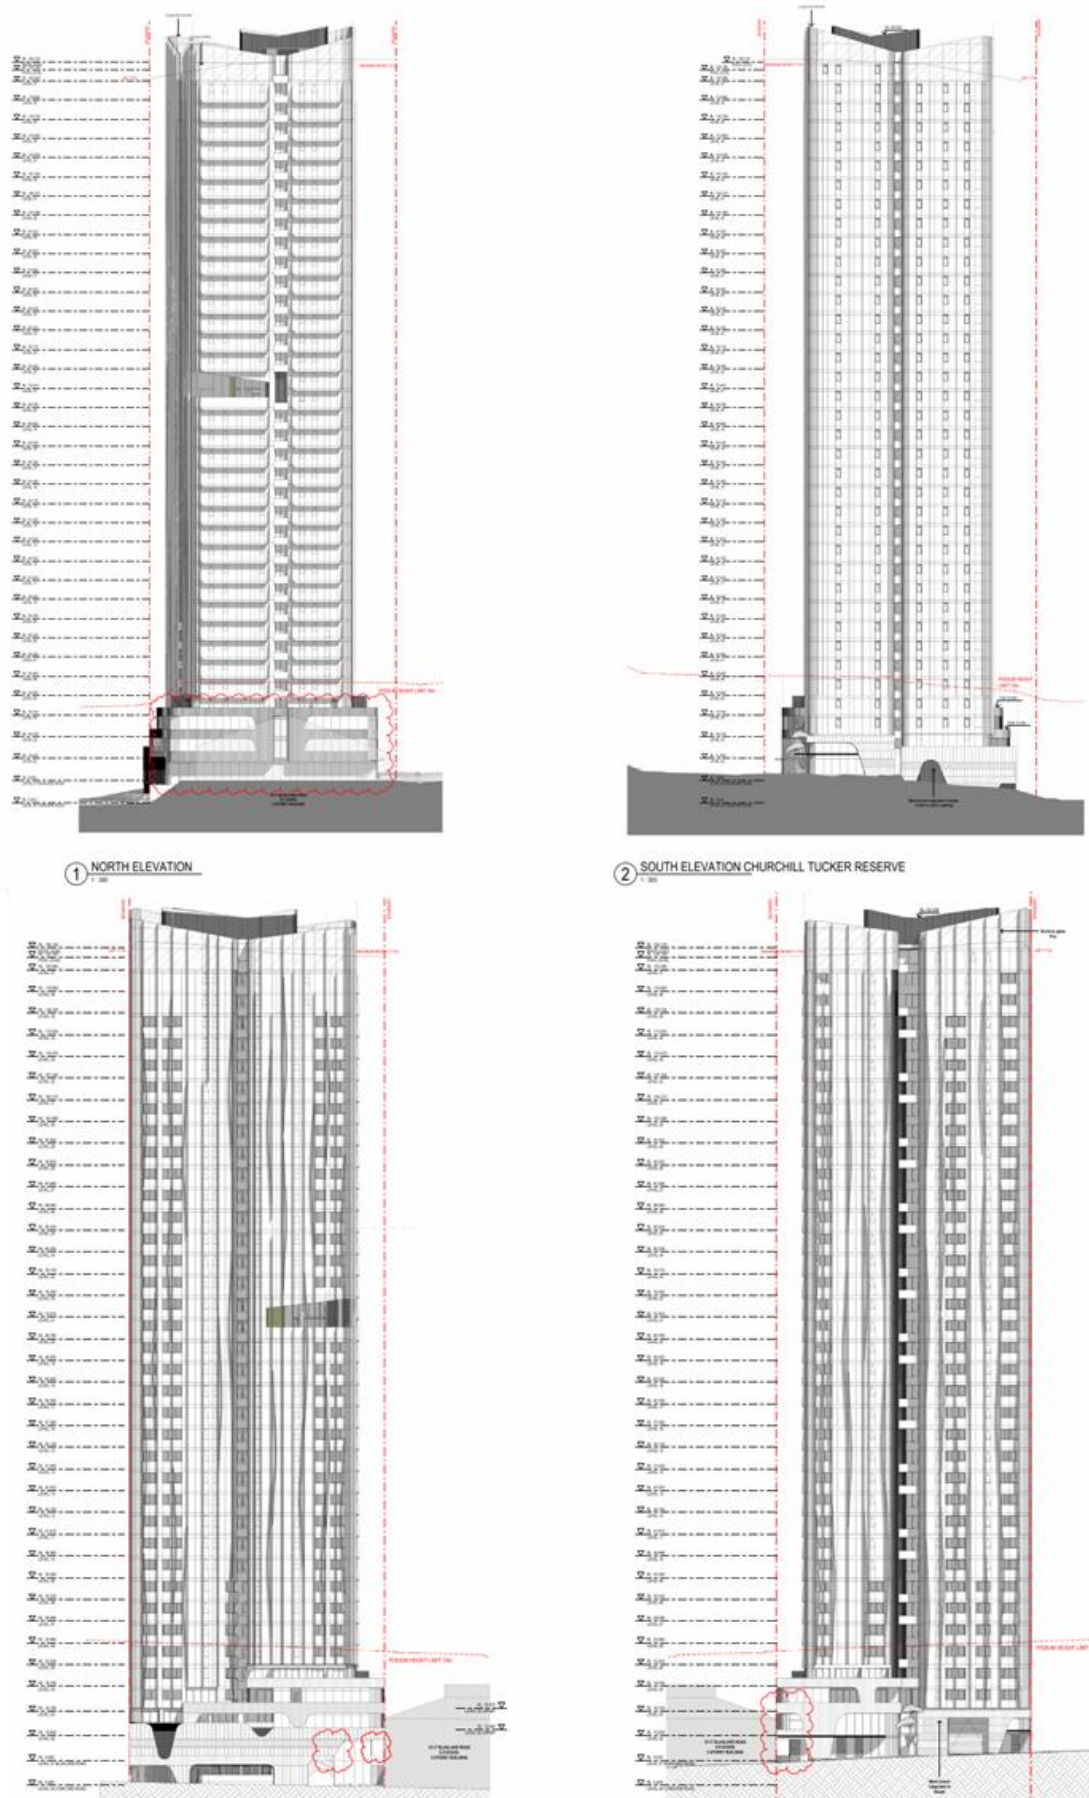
| Proposed Elevations (Source: Applicant's Architectural Plans)
